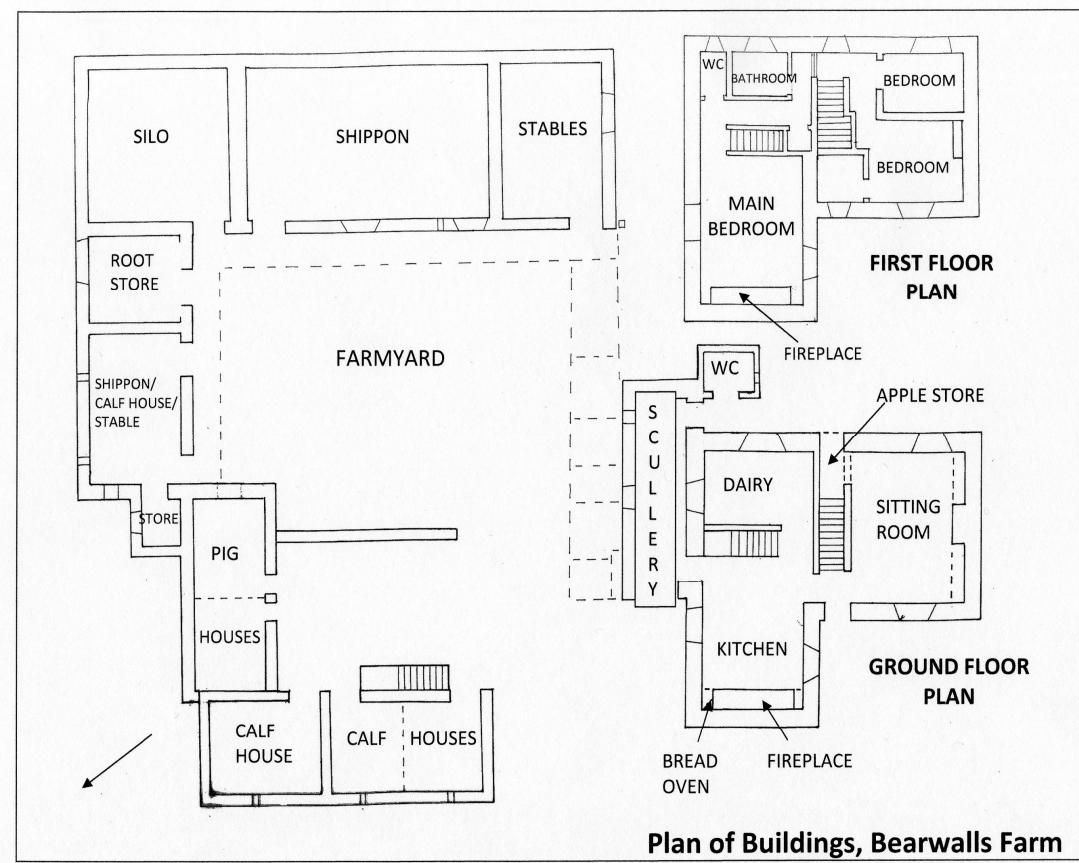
plan of buildings, based on plan of July 1964 in Comdt file. Arrow bottom left indicates direction of north.
